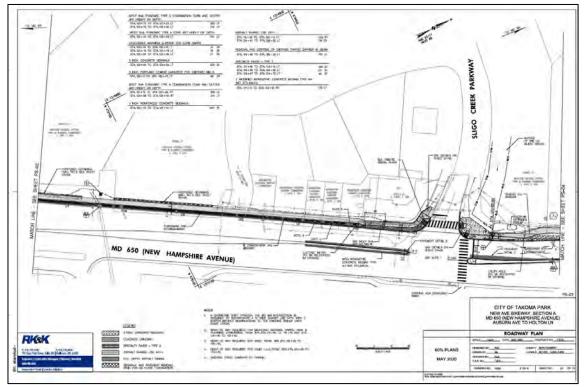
Plan View of Proposed New Avenue Section A Improvements (Part 3)
